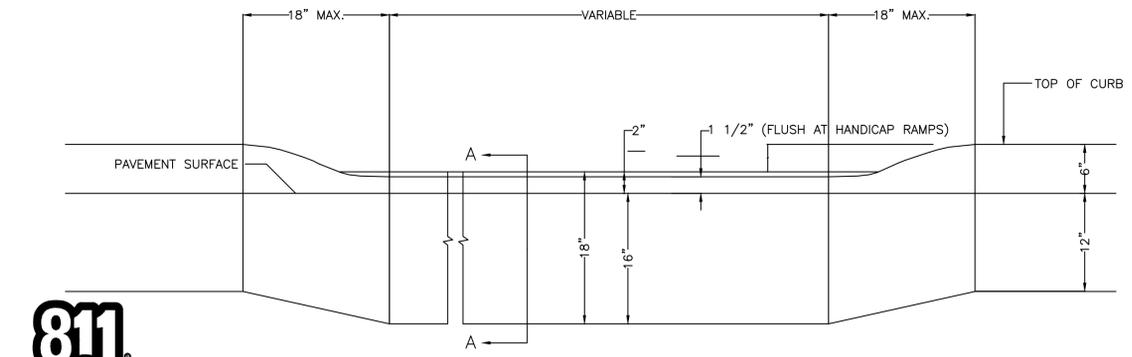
DETAIL: CONCRETE CURB & PAVEMENT SECTION (LOCAL STREETS) NOT TO SCALE
